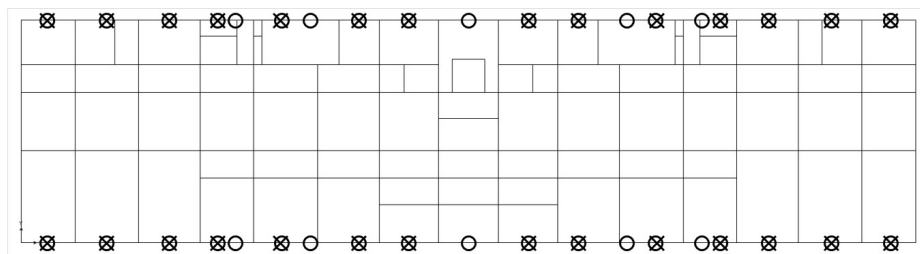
Damper Placement at 3rd floor (R-X); MSSSA: 38 dampers; ODAM: 28 dampers
